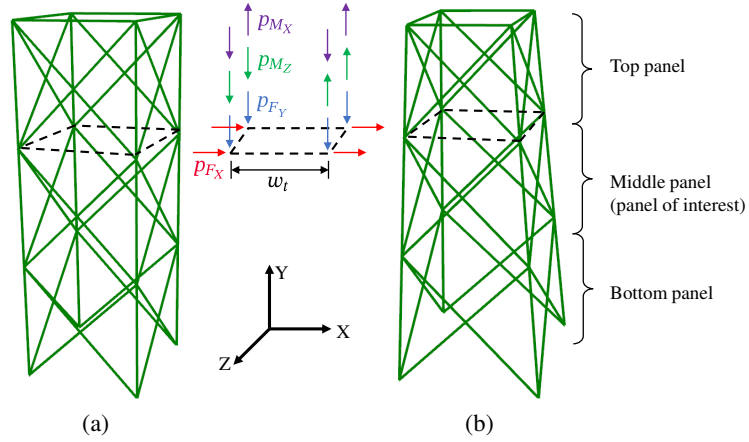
Illustration of the 3-panel structures and the load application: (a) straight type; (b) inclined type.
